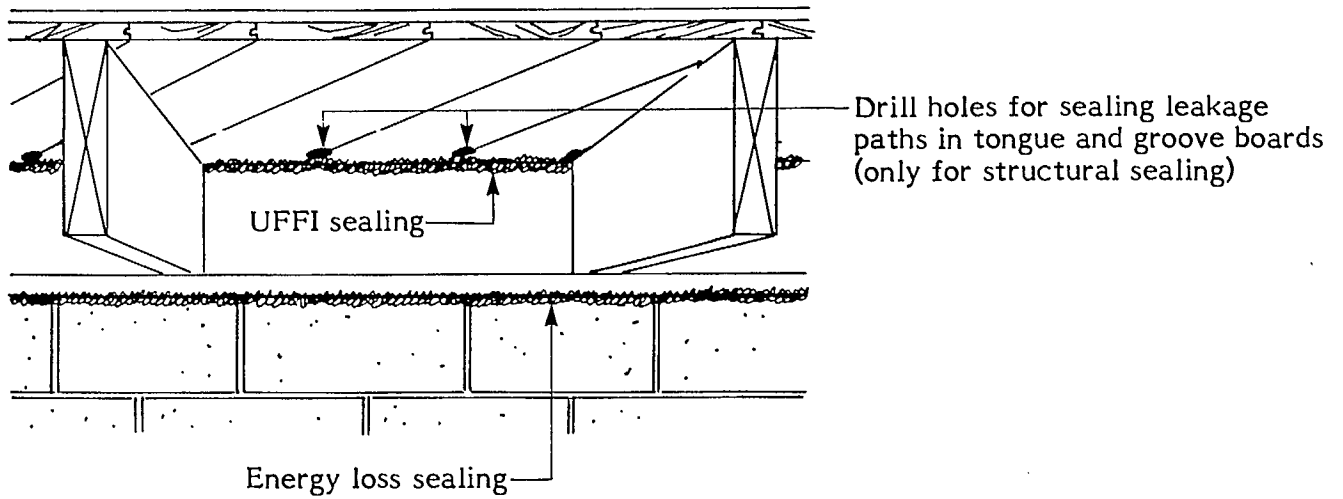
BOARD SUBFLOOR (Joists Atop Foundation)
